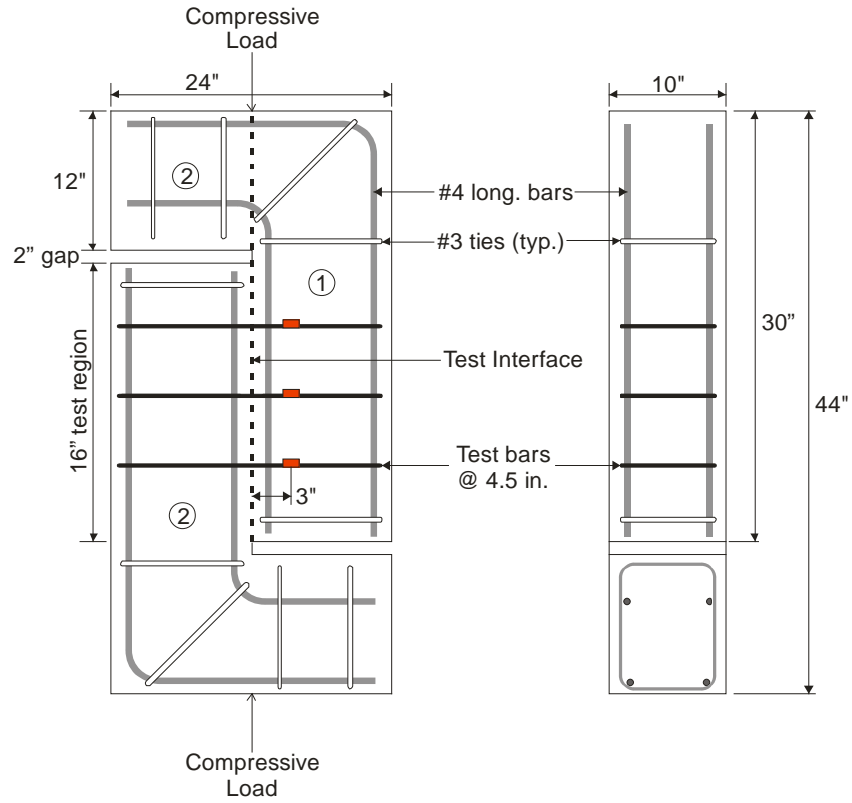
Push-off specimen dimensions and reinforcing details.
